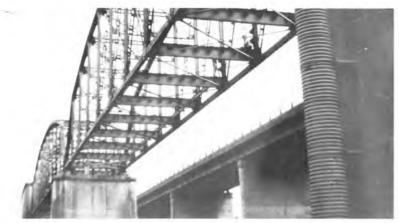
Existing bridge with concrete deck and stringer beams removed.
